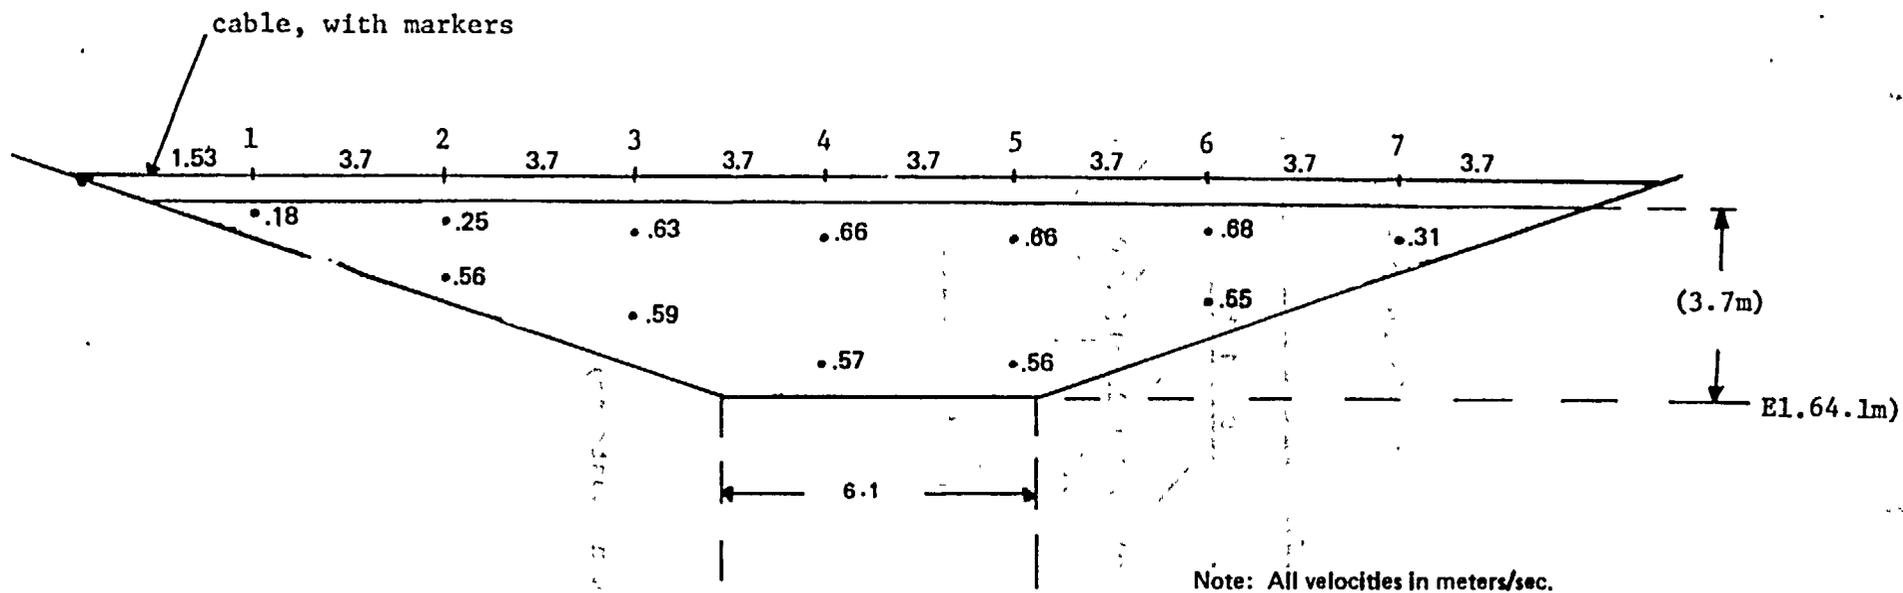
Approximate discharge canal cross section at test site (looking upstream)
